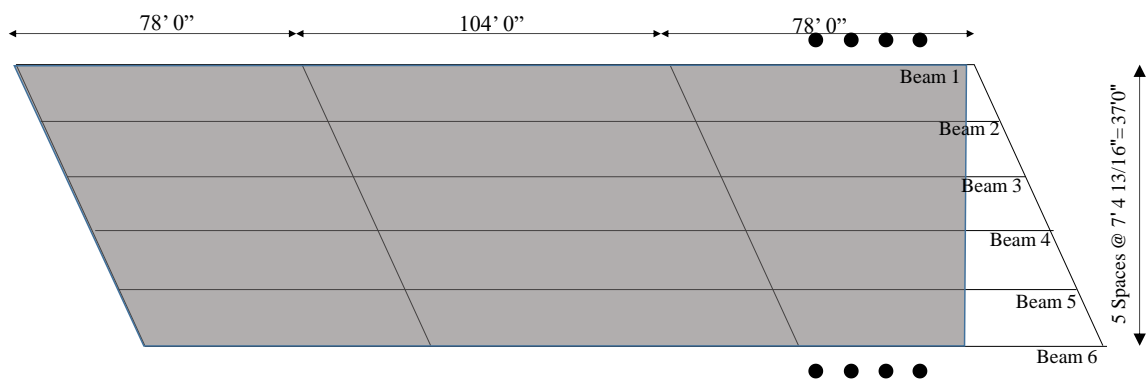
260 ft Standard Bridge Span 3 vehicle and wet concrete load for skewed bridges
